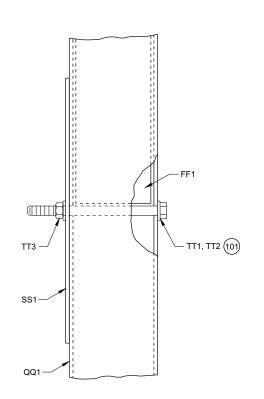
DETAIL "B" STEEL PIPE ASSEMBLY (BEAM GUARD AND W BEAM END SECTION NOT SHOWN)
